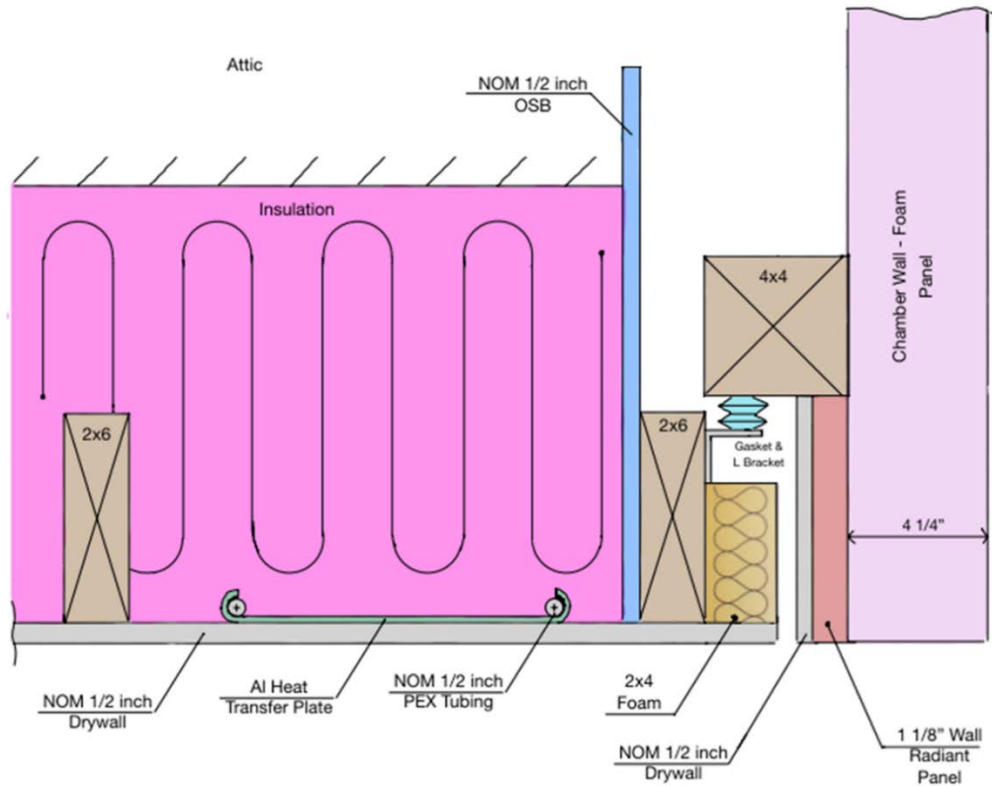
Detailed cross section of radiant ceiling edge including mounting structure
